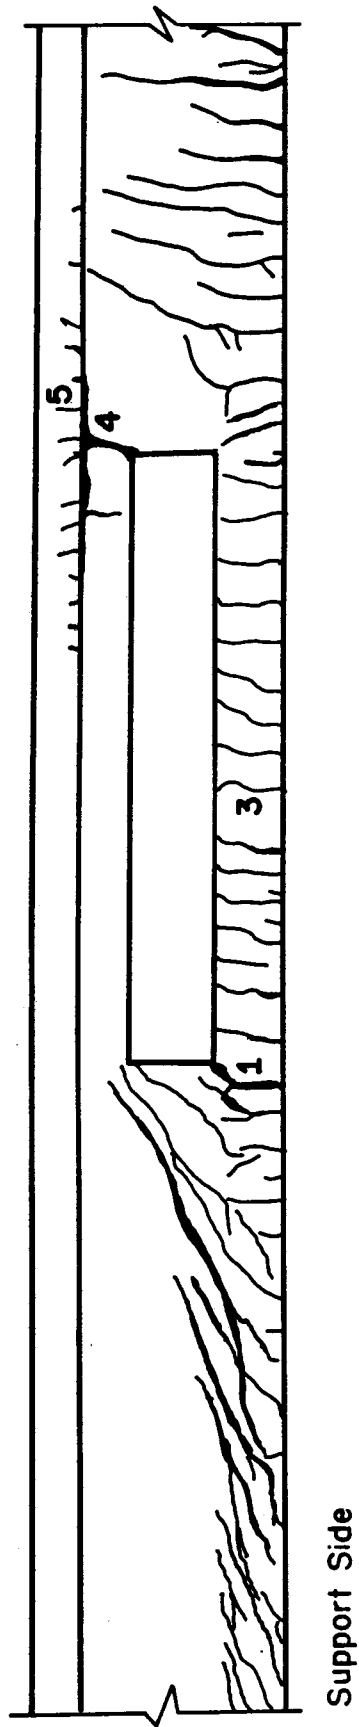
Crack Pattern - BEAM C1.
